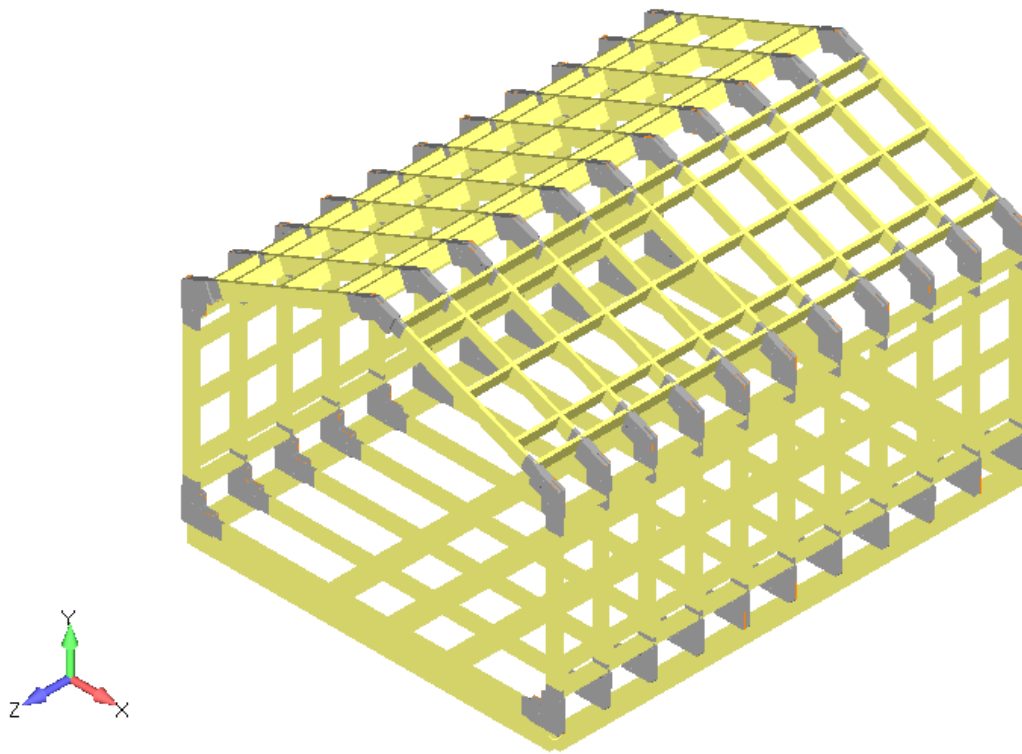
General view of the frame of the FINHA gable roof building, frame width 5 m
